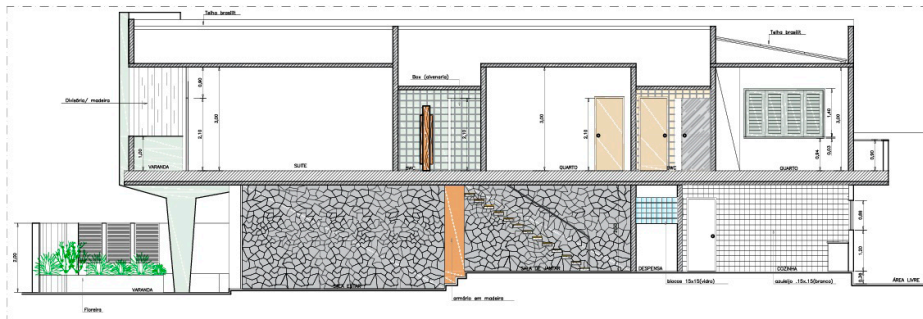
Cleon Furtado's Dinner and Living room Wall. Author: Barbosa and Nunes, 2019.
